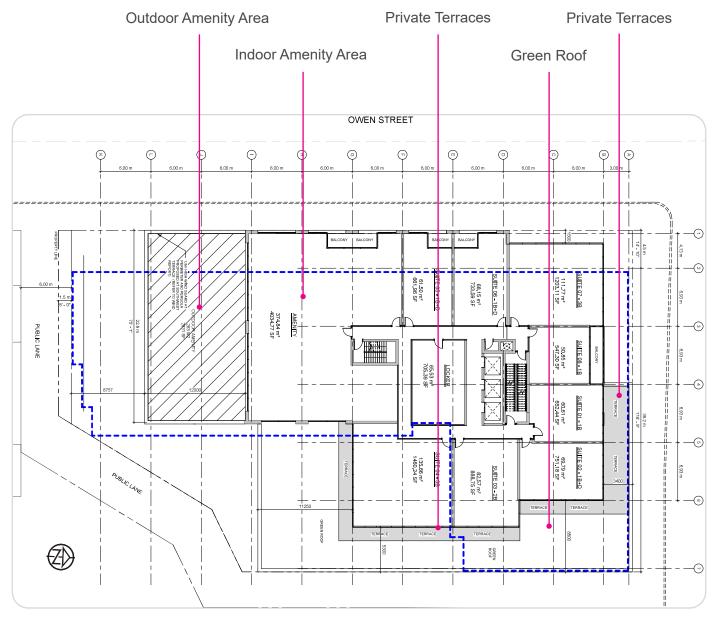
Level 5 Floor Plan, prepared by Scott Shields Architects Inc.
